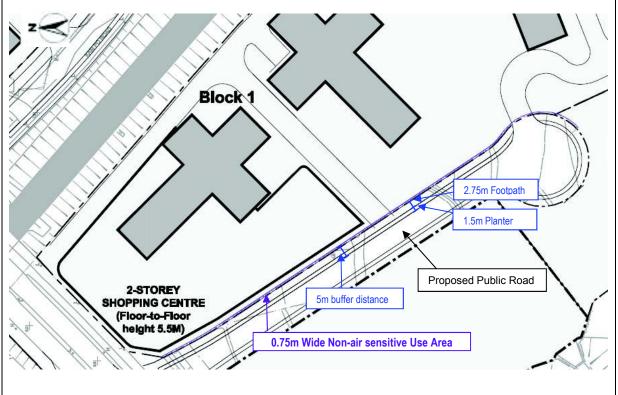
Proposed Non-air Sensitive Use Area for Site 1
